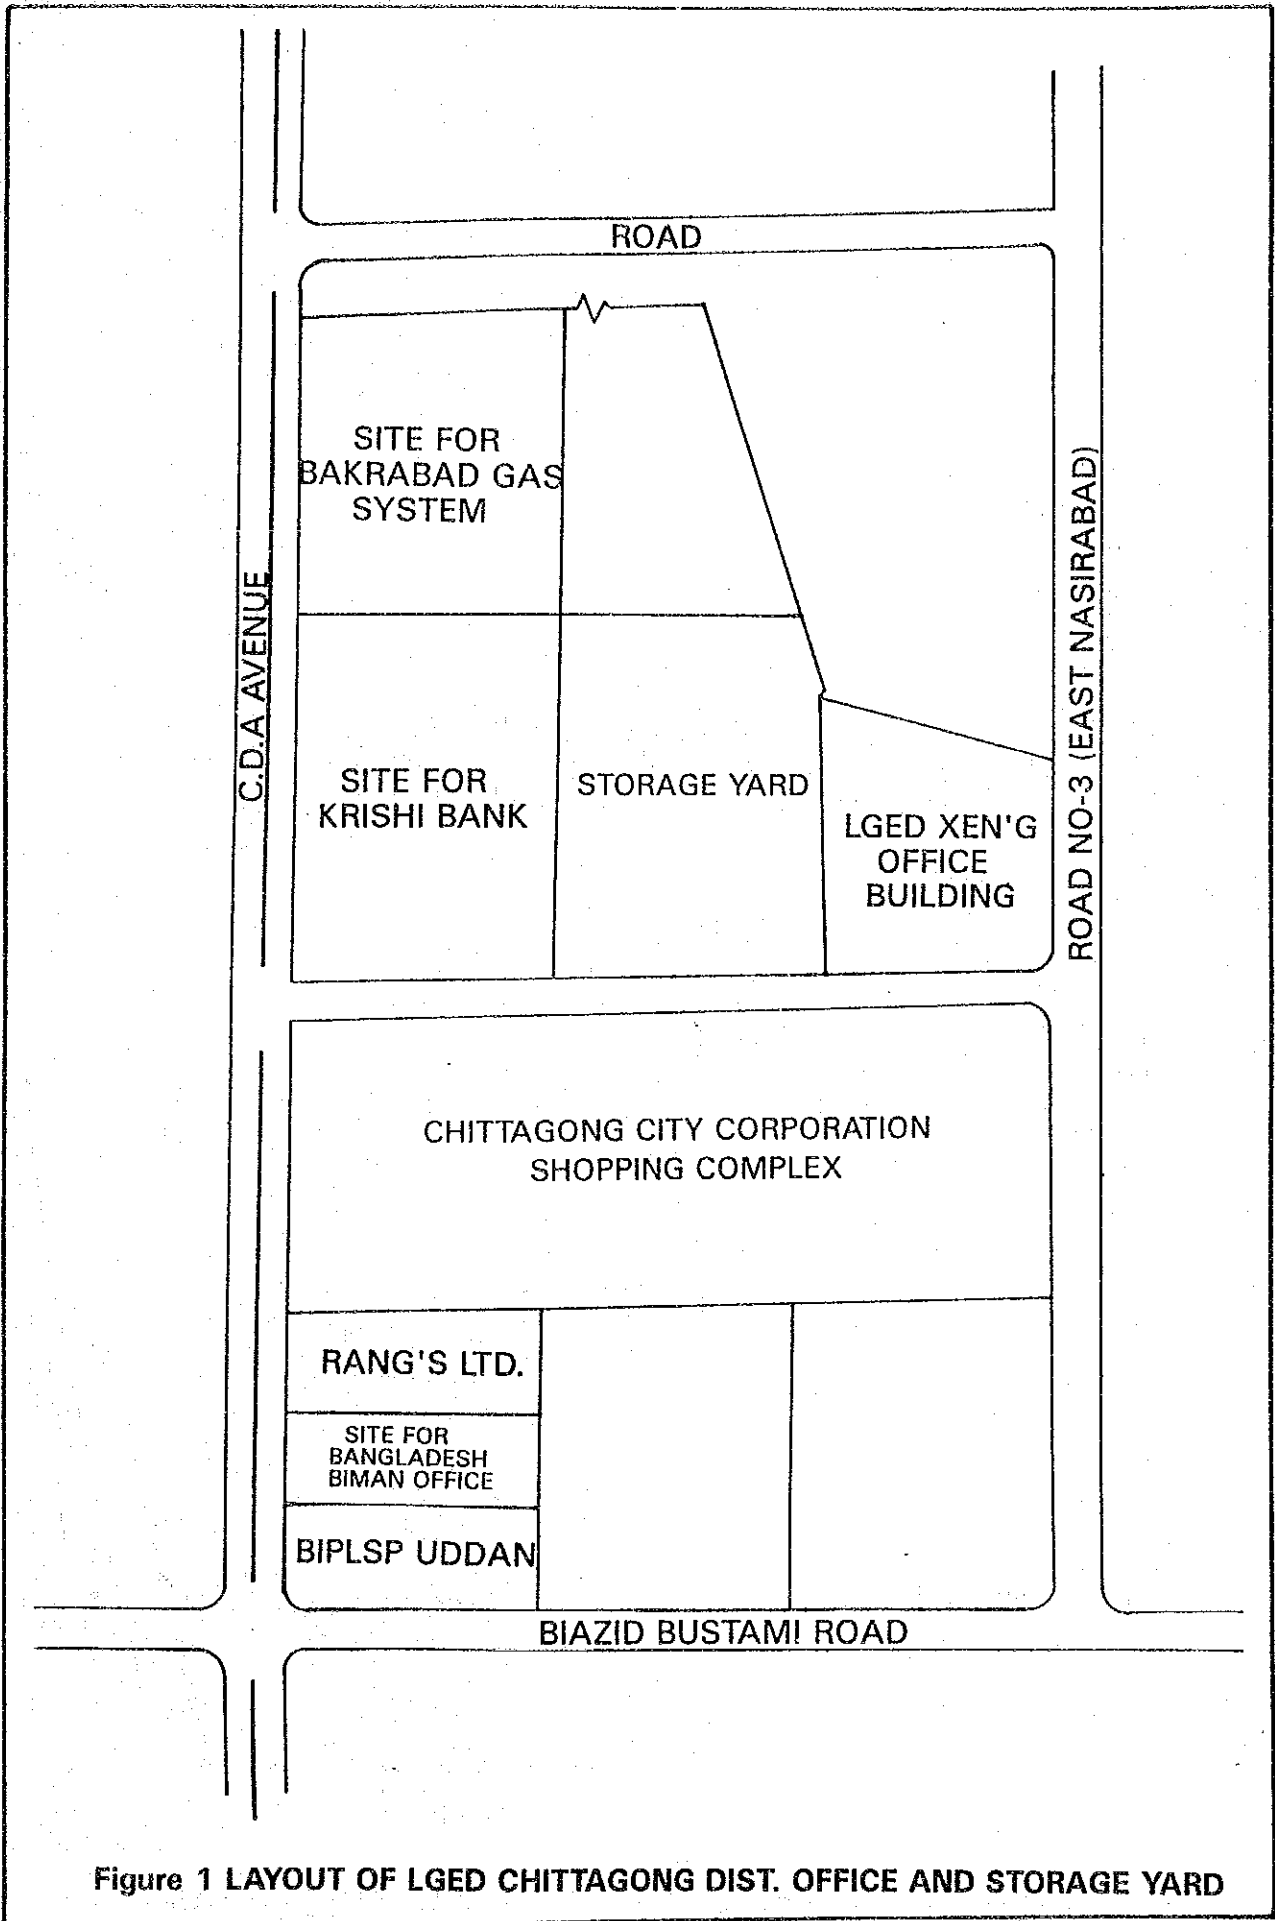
LAYOUT OF LGED CHITTAGONG DIST. OFFICE AND STORAGE YARD
